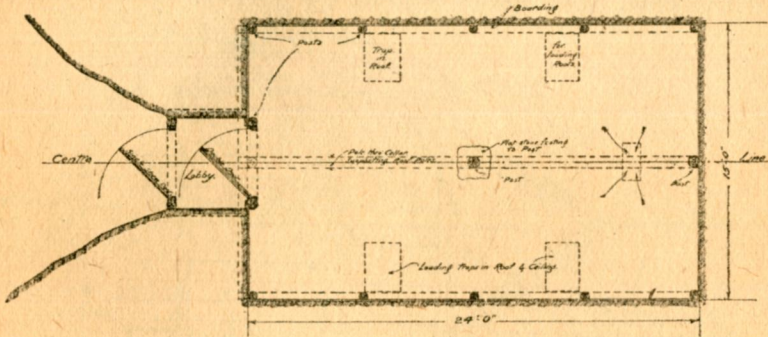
PLAN OF UNDERGROUND ROOT CELLAR.
